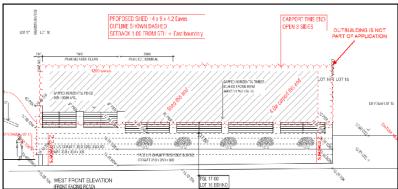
West elevation of retaining with mark-up of retaining height in red
